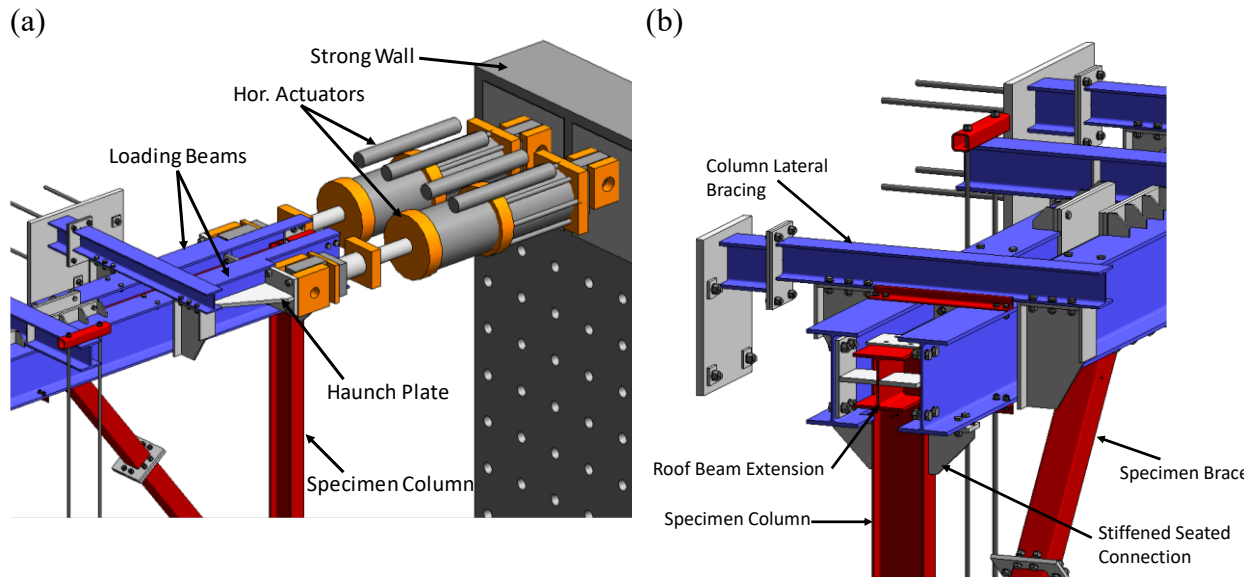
Loading beam: (a) Details of horizontal actuator and loading beam connections; (b) Details of the frame column and the loading beam connections.
